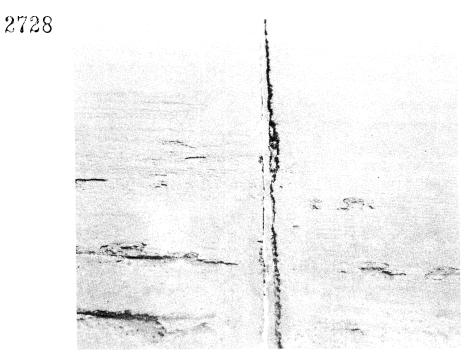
A small joint spall. Surface spalls associated with the reinforcement are also evident.
